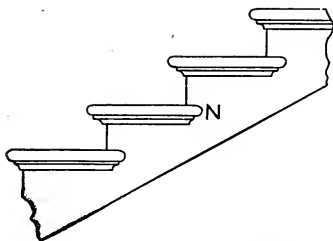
Side Elevation of Part of Stair with Open, Cut and Mitered String.
